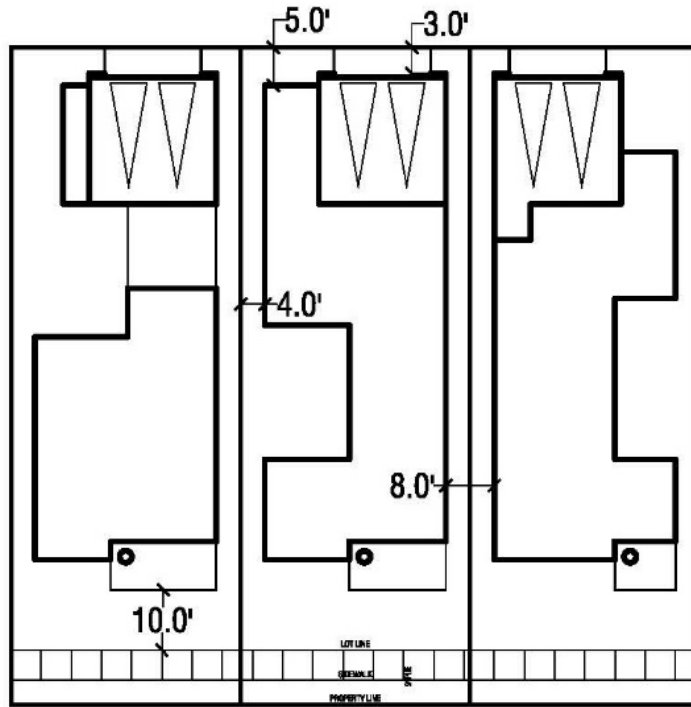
SFD CONCEPTUAL LAYOUTS AND DEVELOPMENT STANDARDS (Applicable to PA 3.1)
